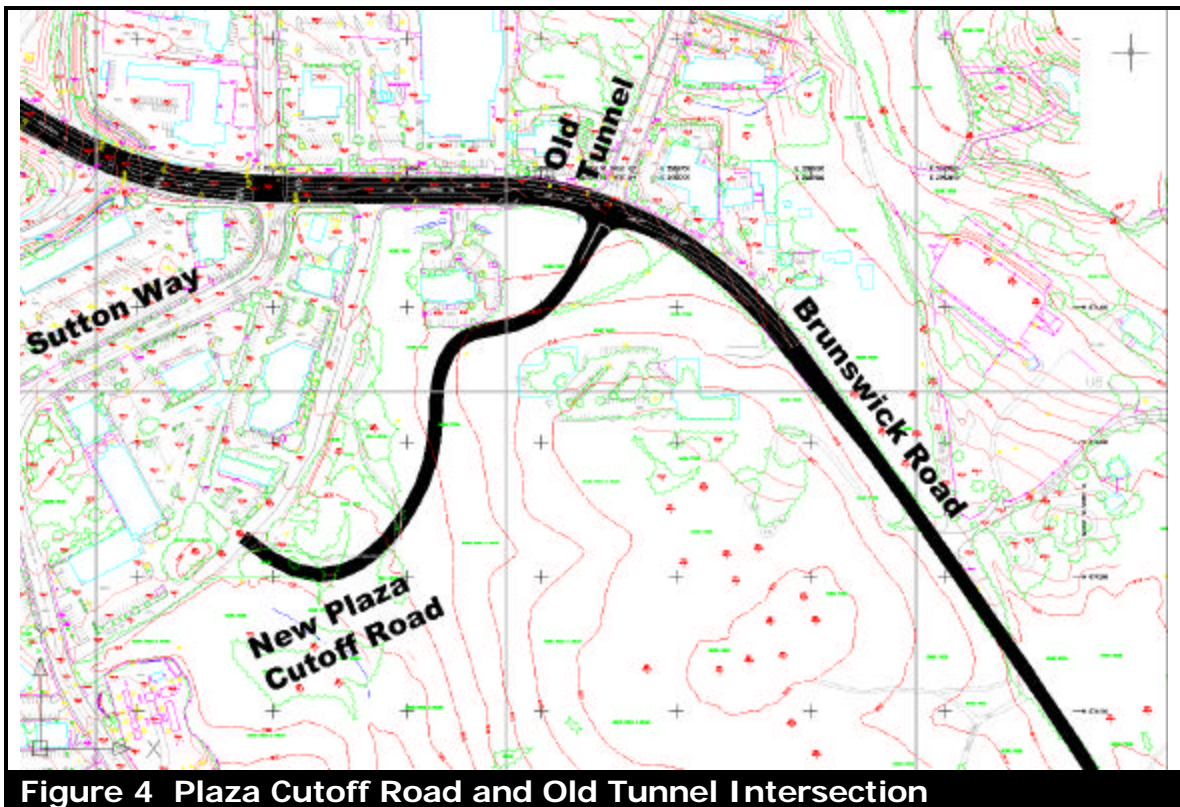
Plaza Cutoff Road and Old Tunnel Intersection
